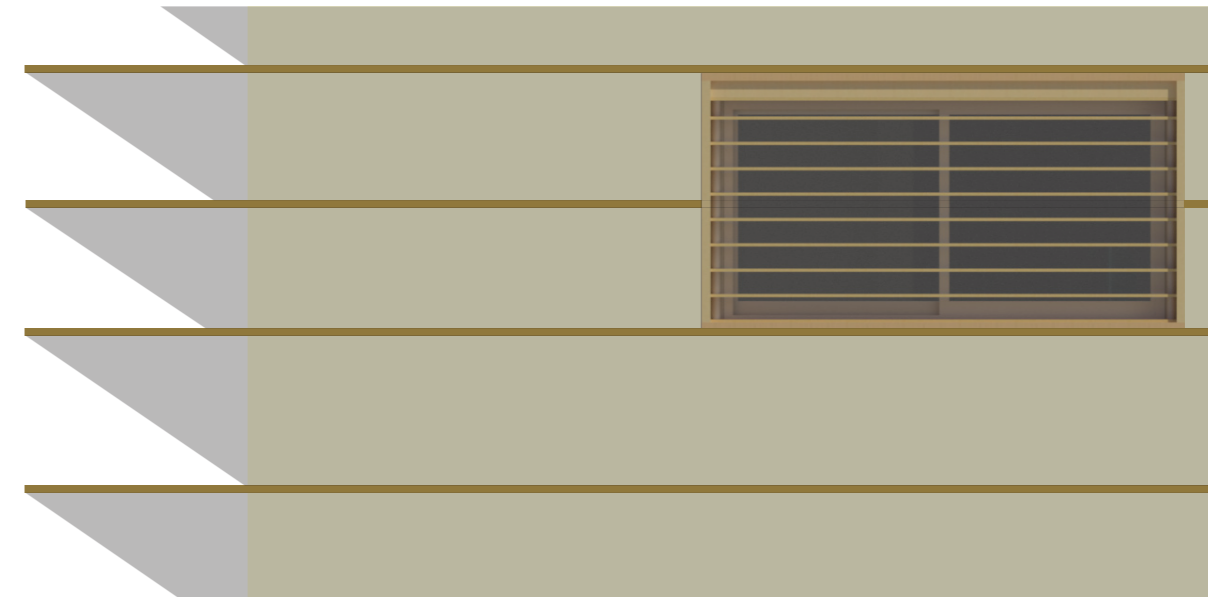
East Facade elevation of Rooms 9, 23 and 38 renovated with the addition of shading on window and a shading overhang of 1.0 m. Source: Own
